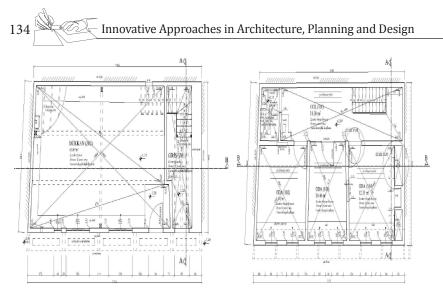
Fatma Sevim Dönmez House's ground floor plan and first floor plan
